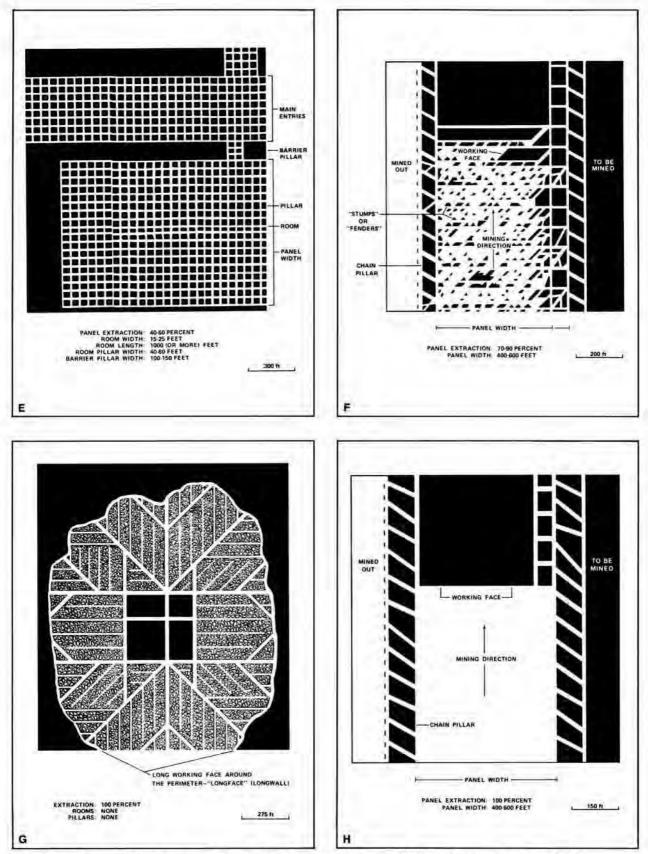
(cont.) Mining methods: (E) checkerboard room and pillar (CRP), (F) high extraction retreat (HER), (G) early (pre-1960) longwall, (H) post-1959 longwall
